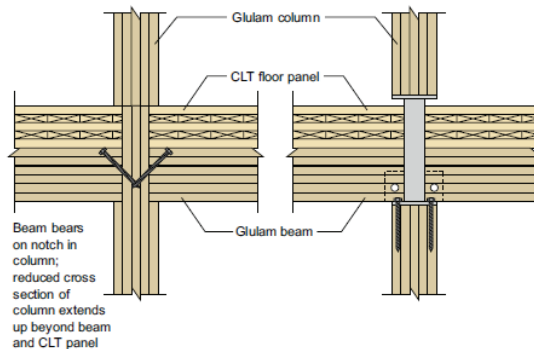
Example column and beam connections, with beam shrinkage isolated from cumulative building shrinkage
